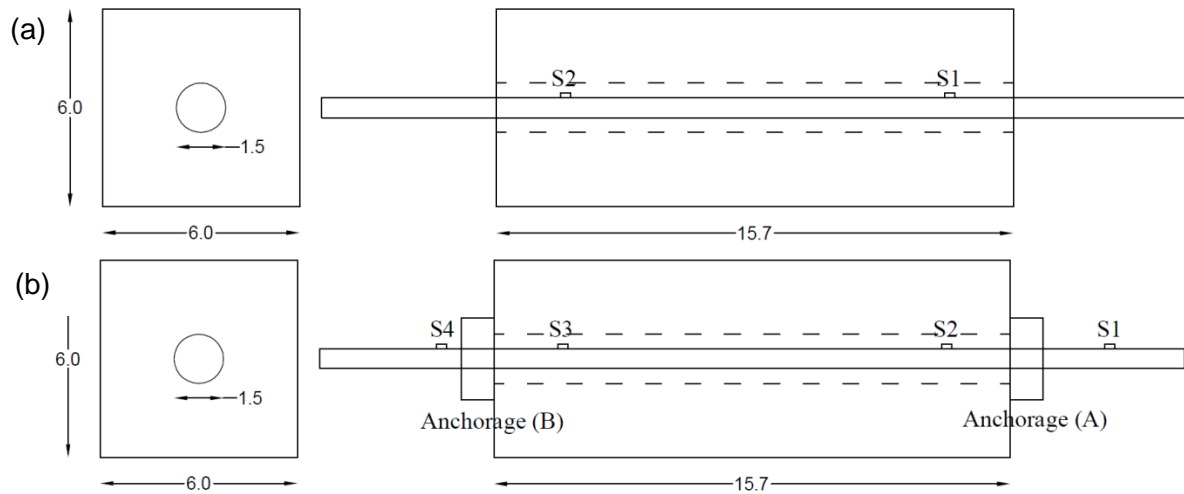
Sensors layout: (a) control beam, and (b) post tensioned beam
